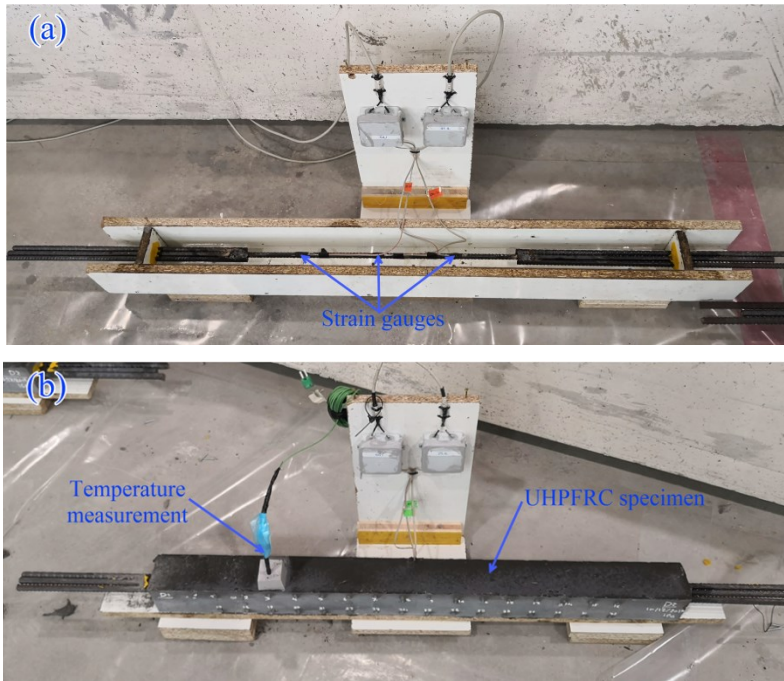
28: UHPFRC specimens for test, (a) position of the strain gauges and cable connection details, (b) concrete specimen with the wood base after stripping of lateral wooden panels.
